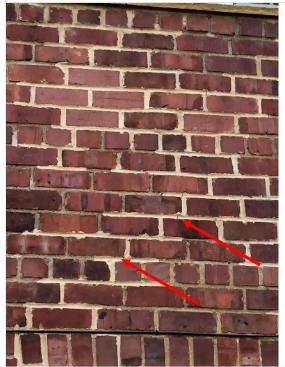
Vertical sealant expansion joint in façade at rear elevation. Not previous repairs in façade adjacent to vertical expansion joint.
